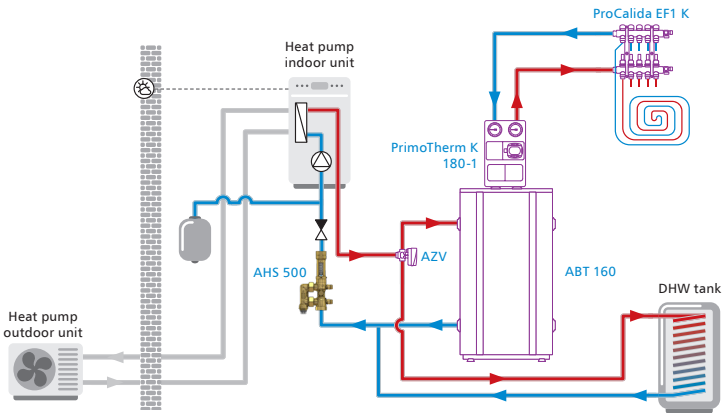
Example of a system diagram with the AHS 500 heat pump service assembly
